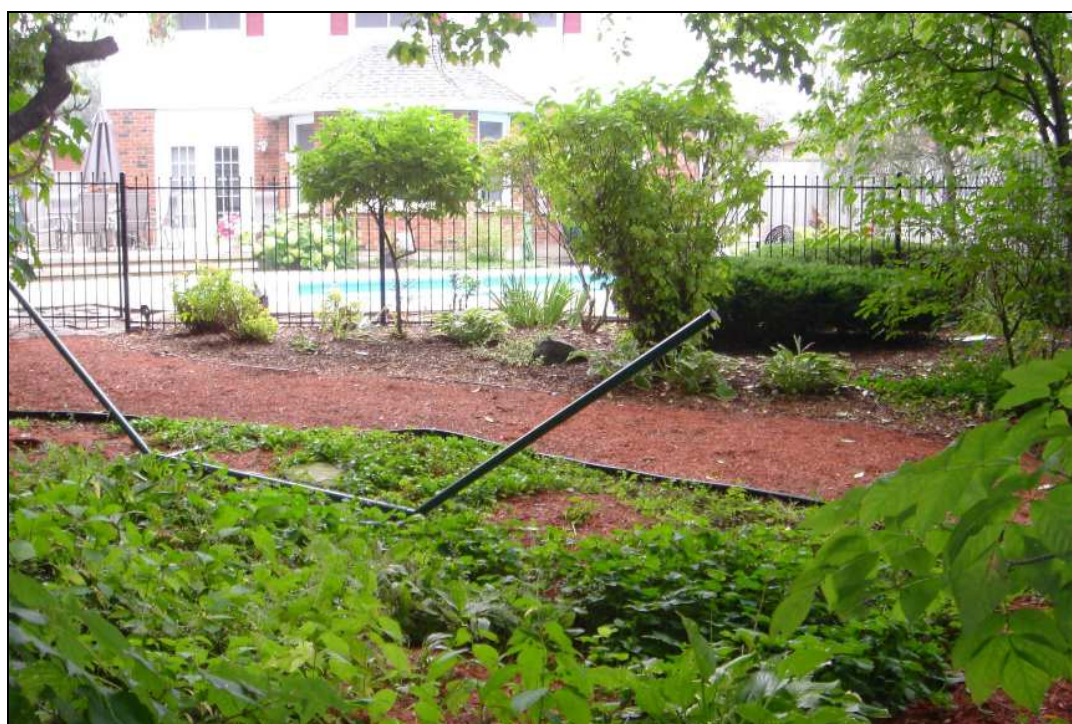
Garden extension encroachment at 102 Stoke Crescent, Monarch Woods, Kitchener
